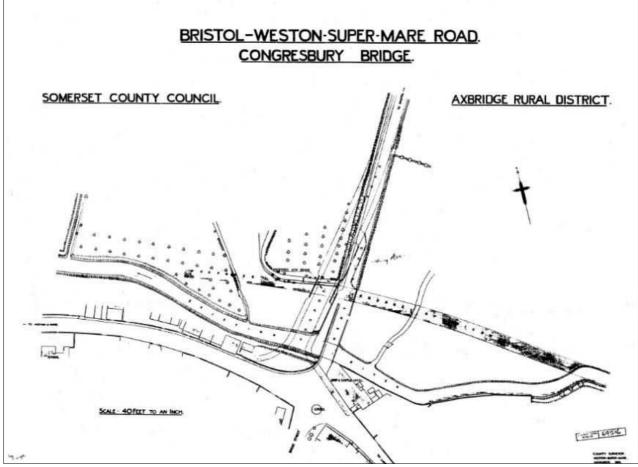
Plan of the new road layout 1924. Courtesy of North Somerset Council Highways Department
